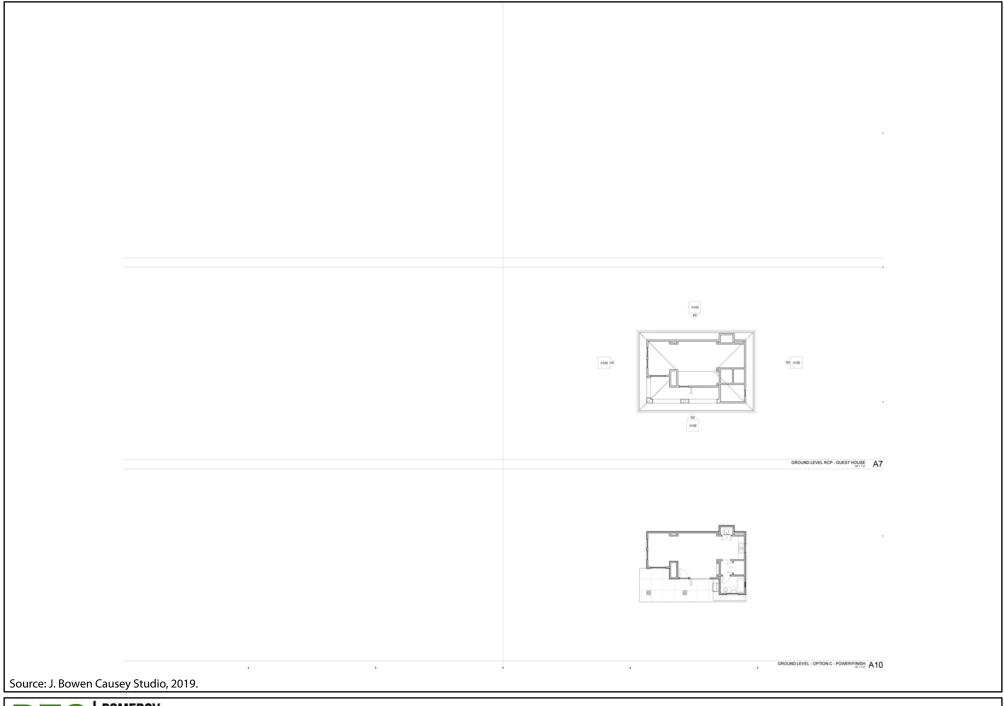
Guest House - Reflected Ceiling, Finish, and Power Plans
